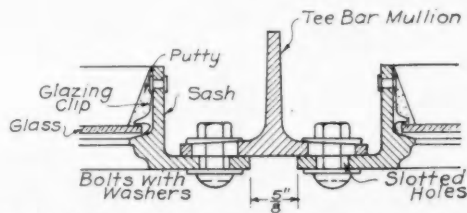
Detail of Sash Connection to Tee Bar Mullion.
